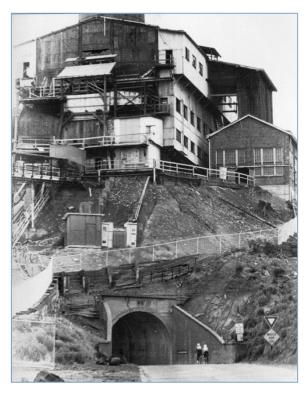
Ruston Tunnel under the former Asarco plant. Photo courtesy of Sherri Forch.
